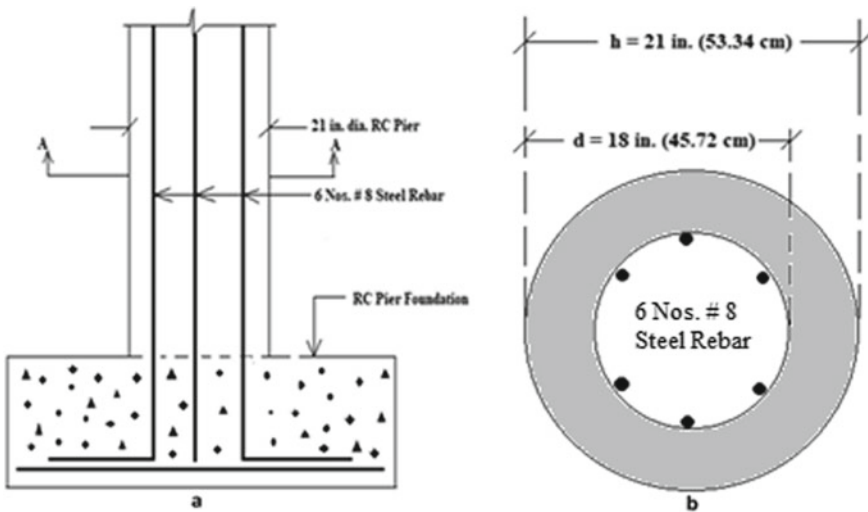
(a) Representative RC bridge pier, (b) Section A-A
